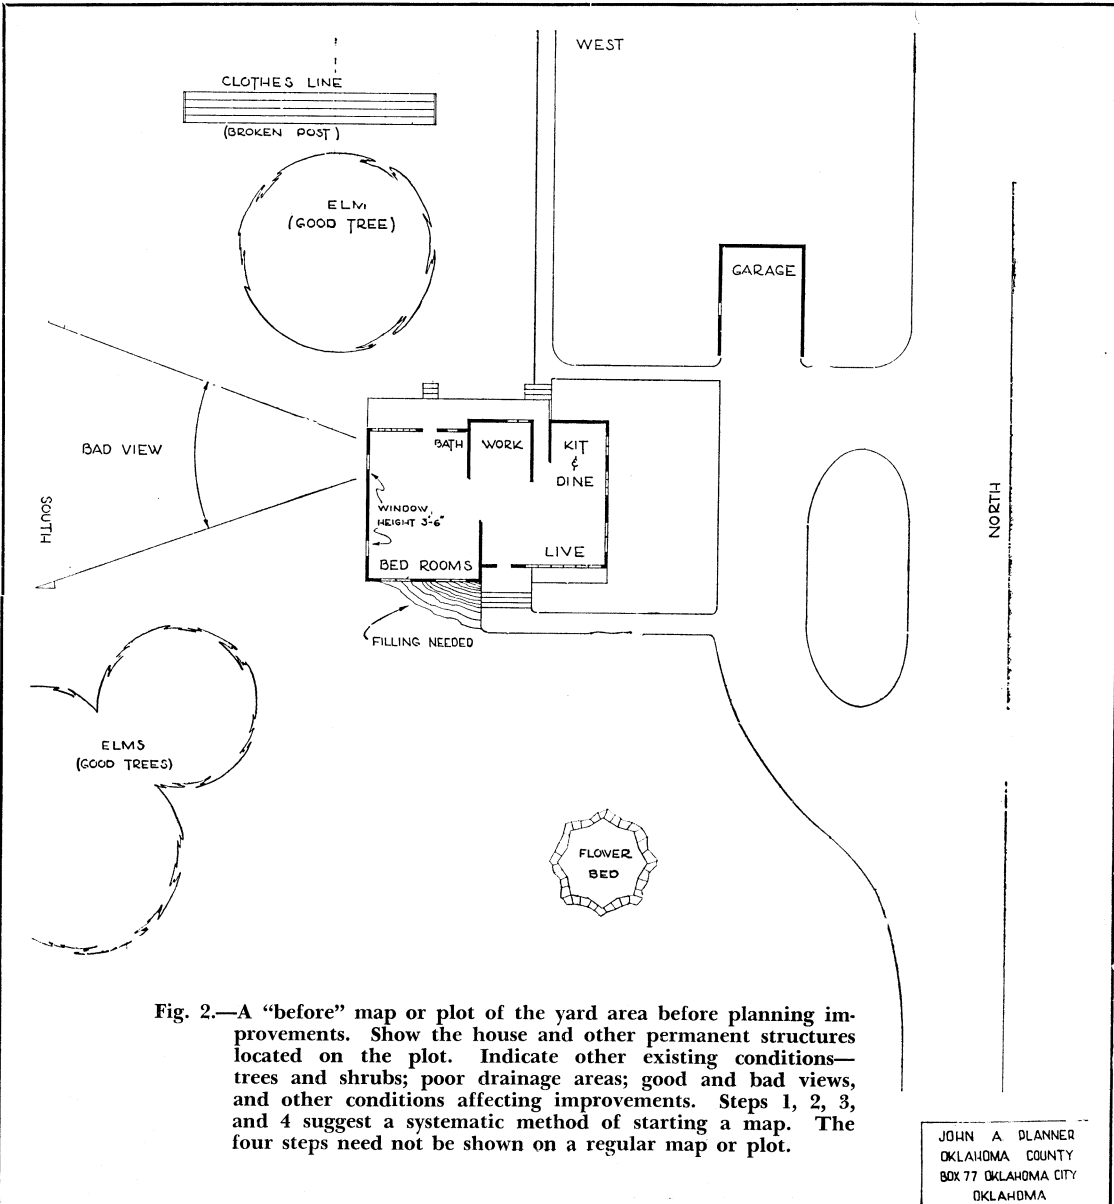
A “before” map or plot of the yard area before planning improvements. Show the house and other permanent structures located on the plot. Indicate other existing conditions—trees and shrubs; poor drainage areas; good and bad views, and other conditions affecting improvements. Steps 1, 2, 3, and 4 suggest a systematic method of starting a map. The four steps need not be shown on a regular map or plot.
